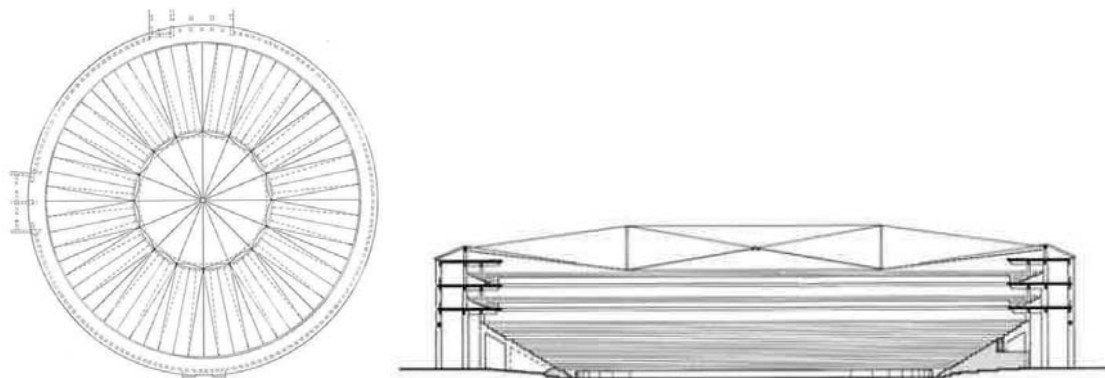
Retractable Roof of Bull-fight ring in Zaragoza [Hol 97]
